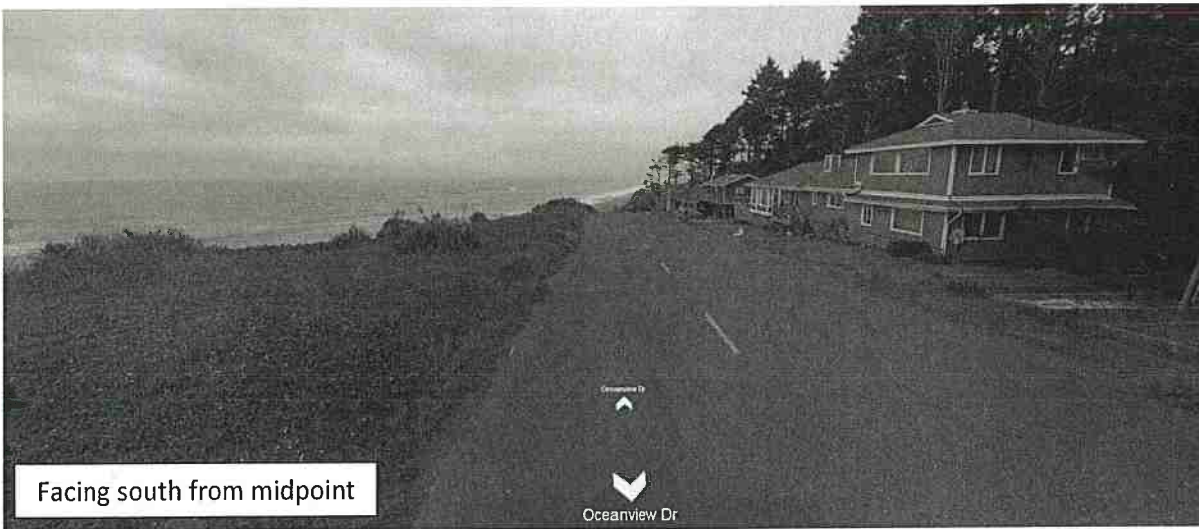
Bing Maps Street View. Road shoulders inadequate for parking.
